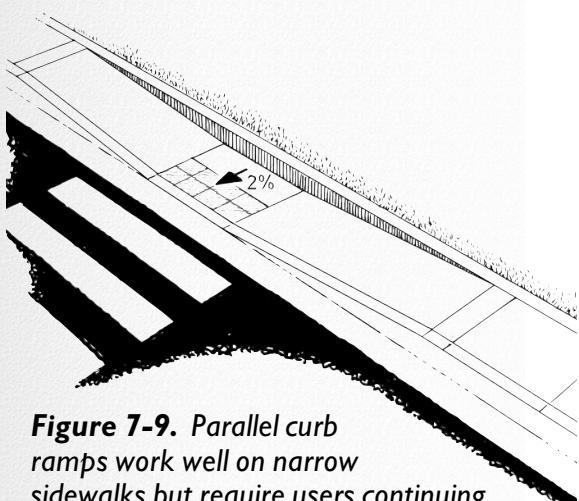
Parallel curb ramps work well on narrow sidewalks but require users continuing on the pathway to negotiate two ramp grades.
